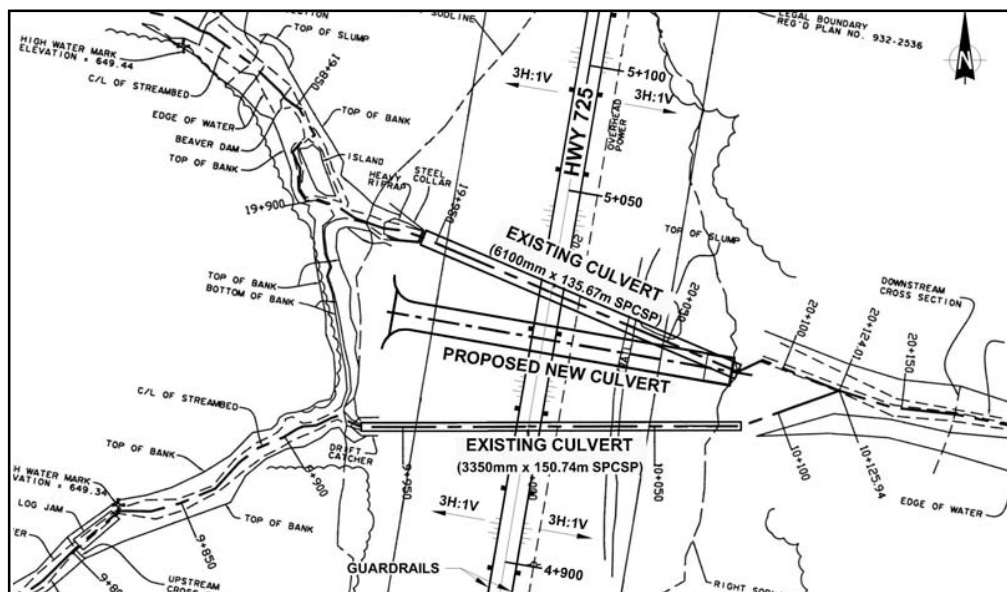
Site plan showing the alignment of existing and replacement culverts.
